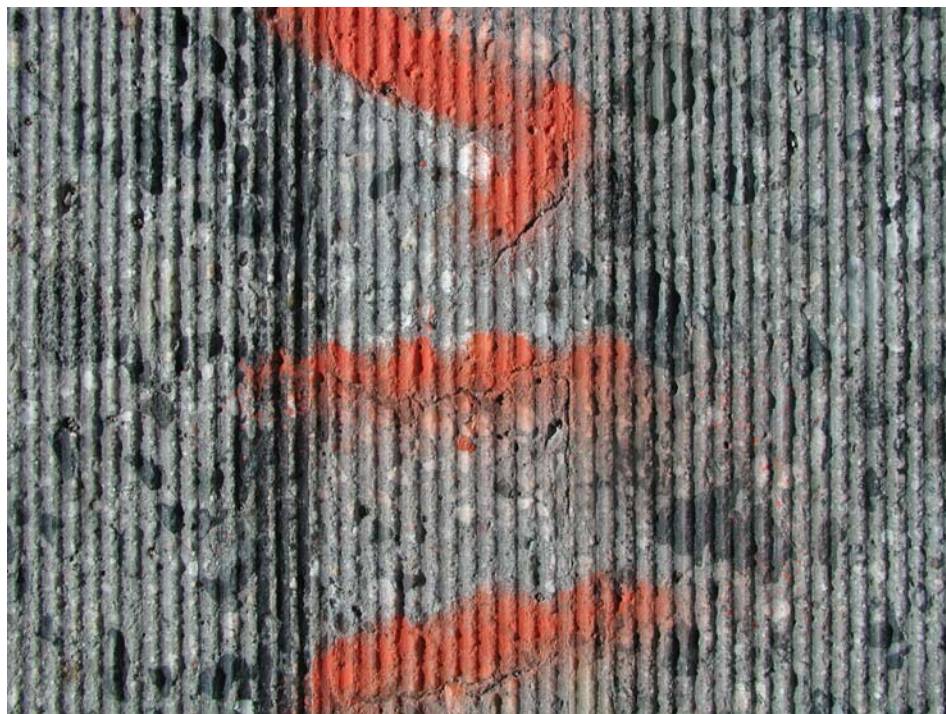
Photograph of DBR slot, Section 558FD, Slab 42, in June 2002, showing some transverse cracking in grout.
